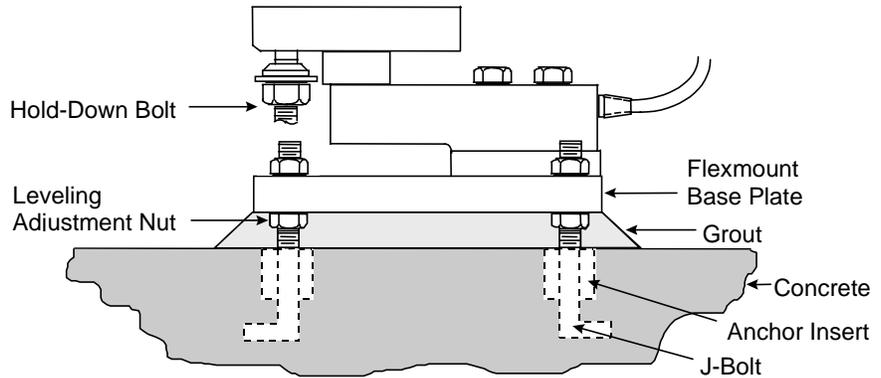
Base Plate Bolted to Unevel Concrete Floor
